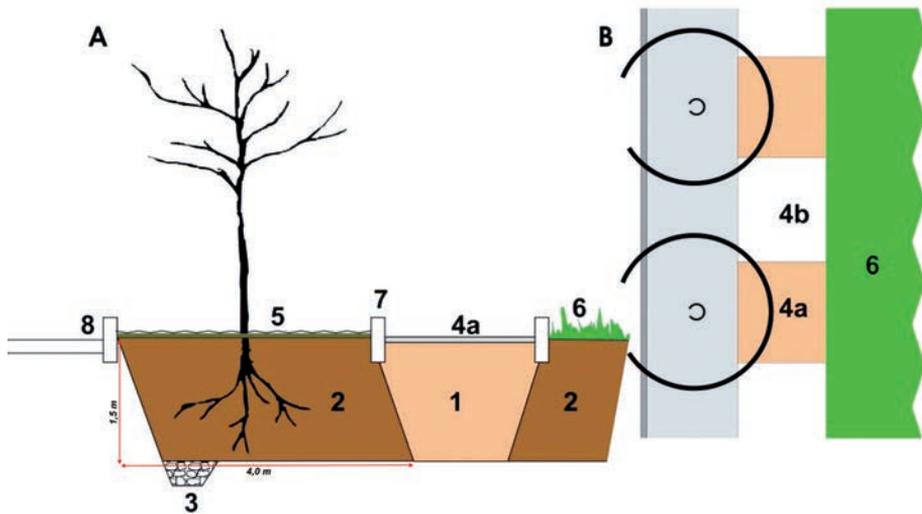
Application of technogenic structural soil under pavement parts – vertical section [A] aerial view [B] after Borowski et al. (2005, modified). Explanations: 1 – structural soil; 2 – soil; 3 – drainage; 4a – part of permeable pavement on structural soil; 4b – part of impermeable pavement; 5 – mulch or plant cover; 6 – grass; 7 – pavement curb; 8 – curb and road surface
